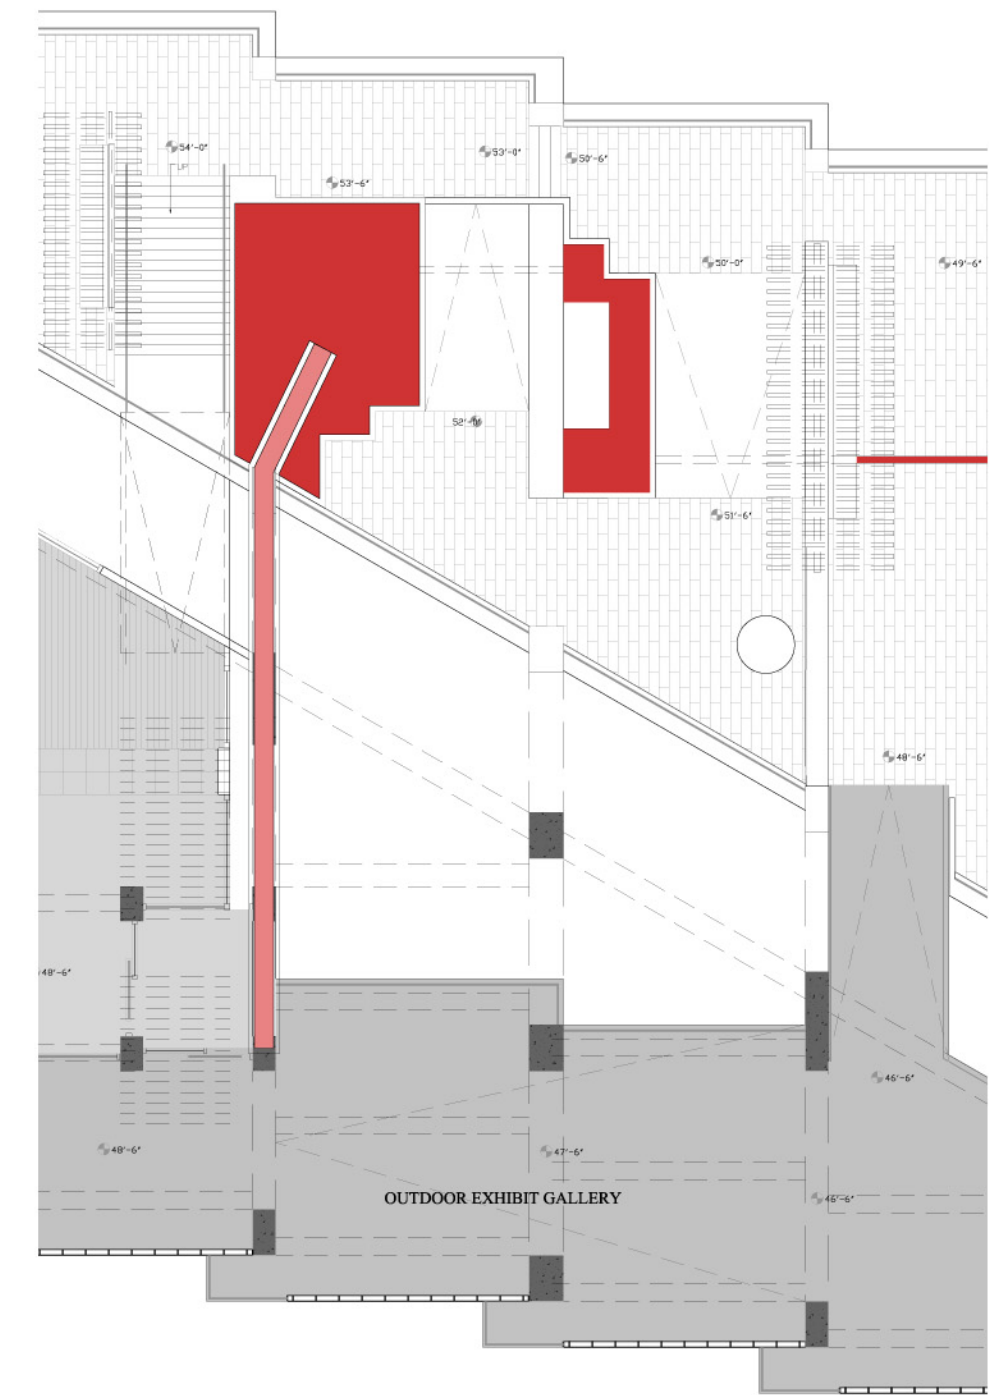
EXHIBIT HALL LEVEL AND LOWER ROOF TERRACE
